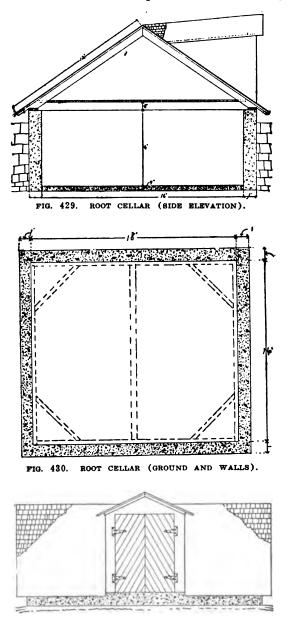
ROOT CELLAR (FRONT ELEVATION).
